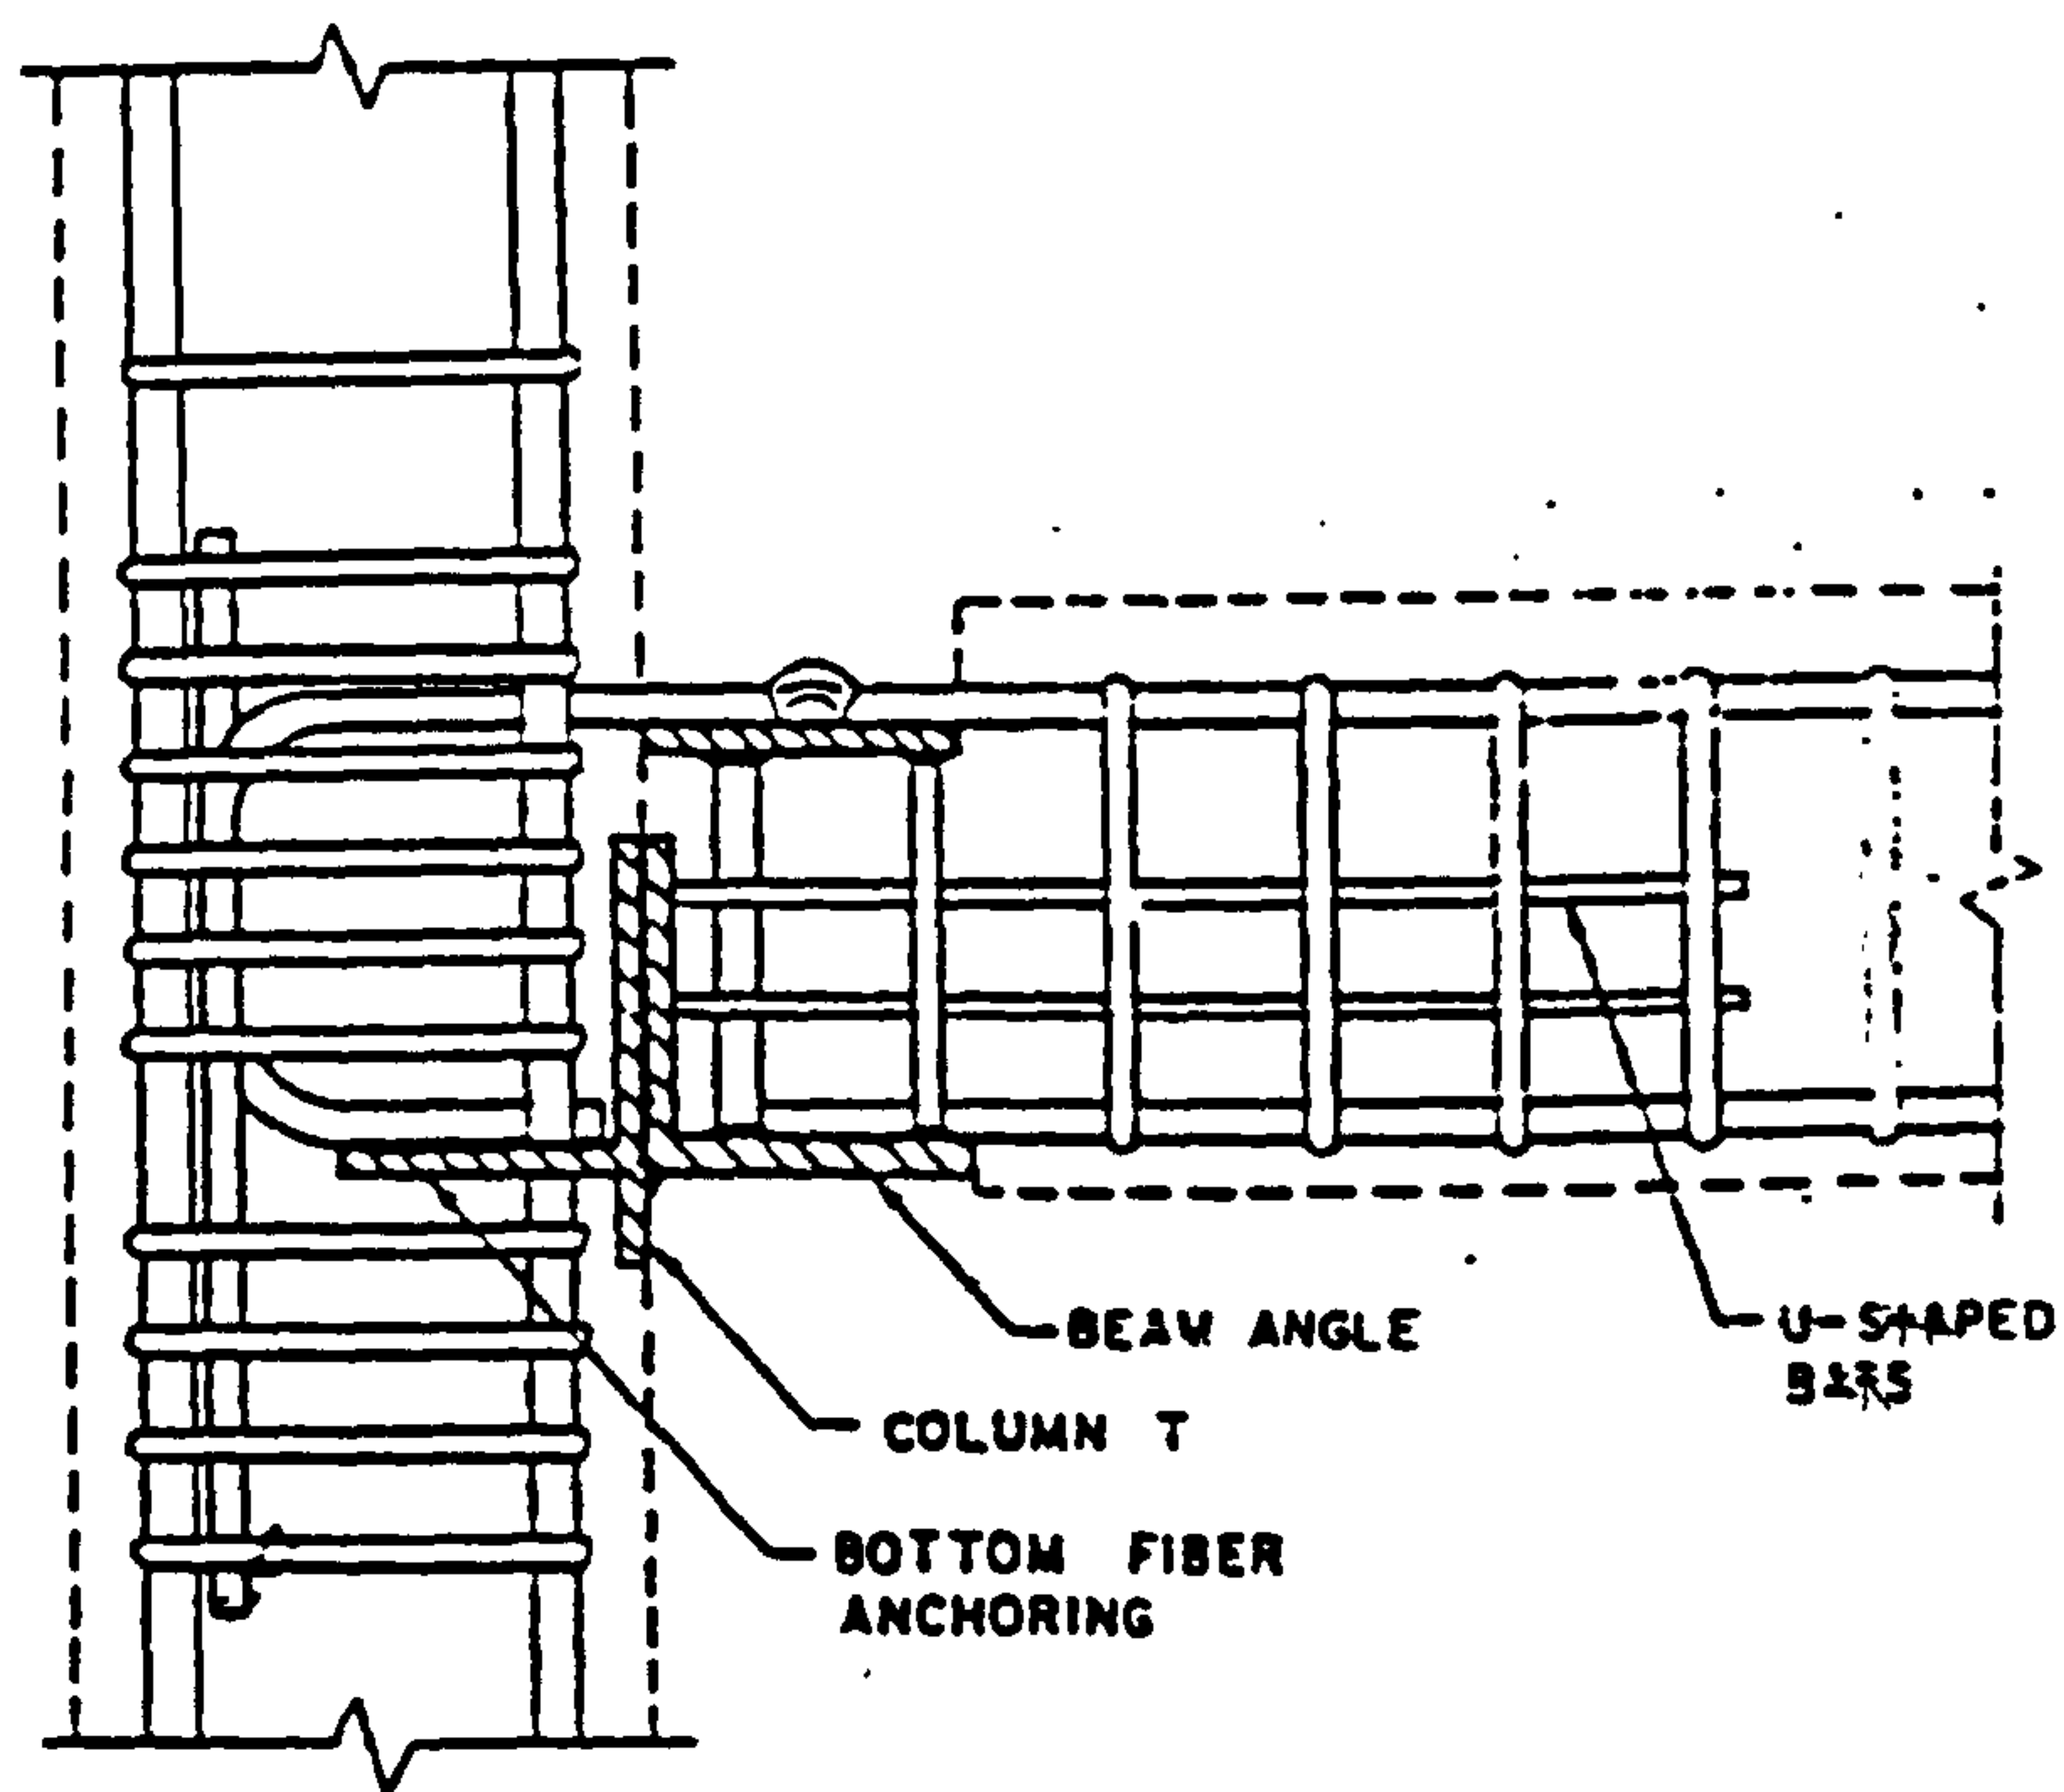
Joint detail used by Pillai and Kirk (1981)
